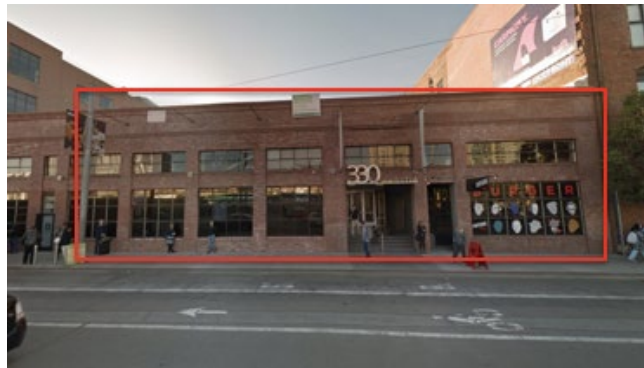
Examples of buildings with adjacent walls (Buildings F and G).
